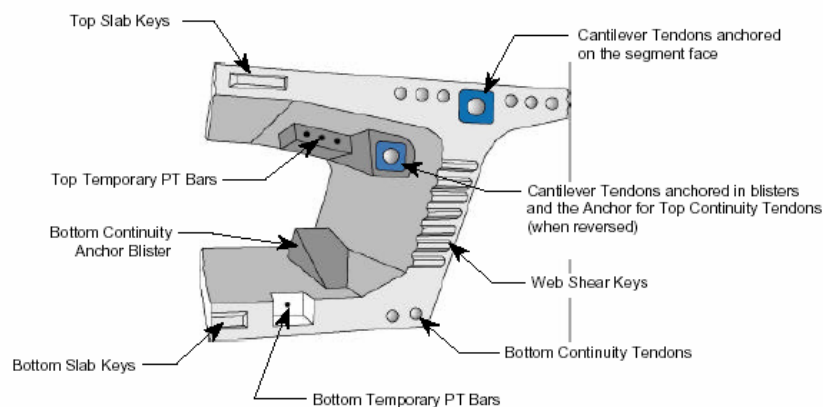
Typical Balanced Cantilever Segment¹⁶
